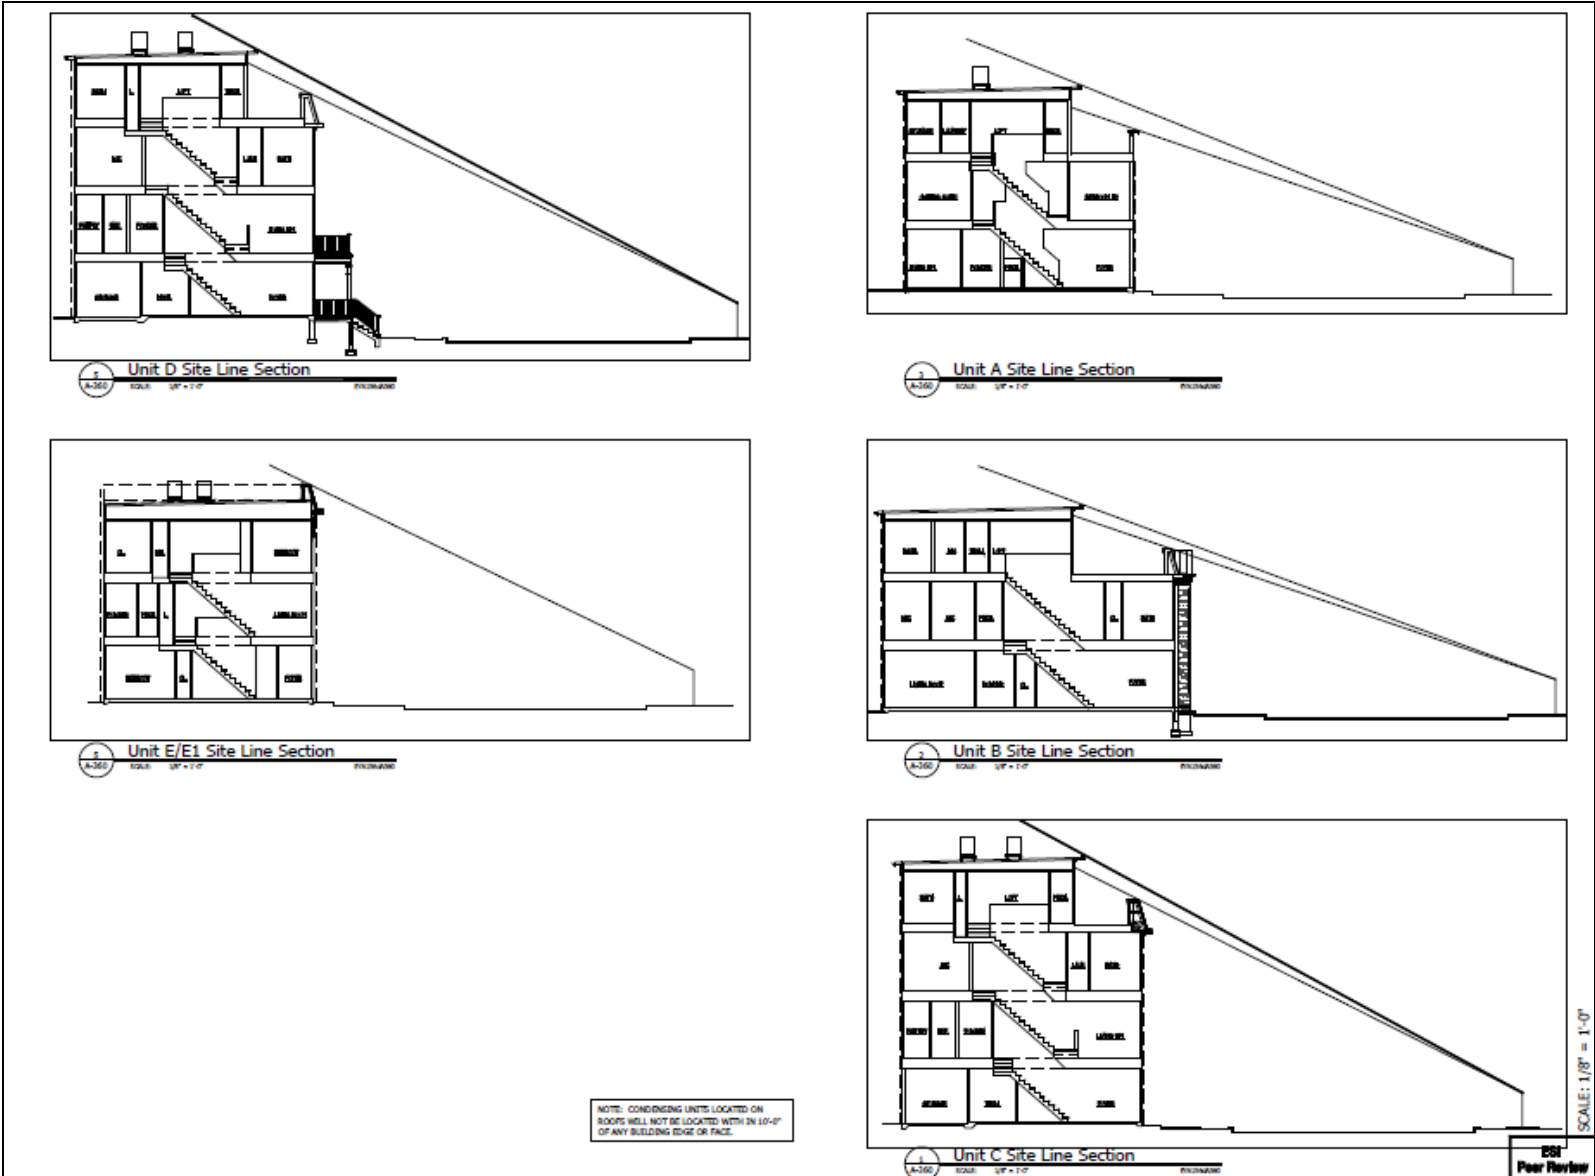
Site lines of various units depicting visibility of rooftop HVAC units.
